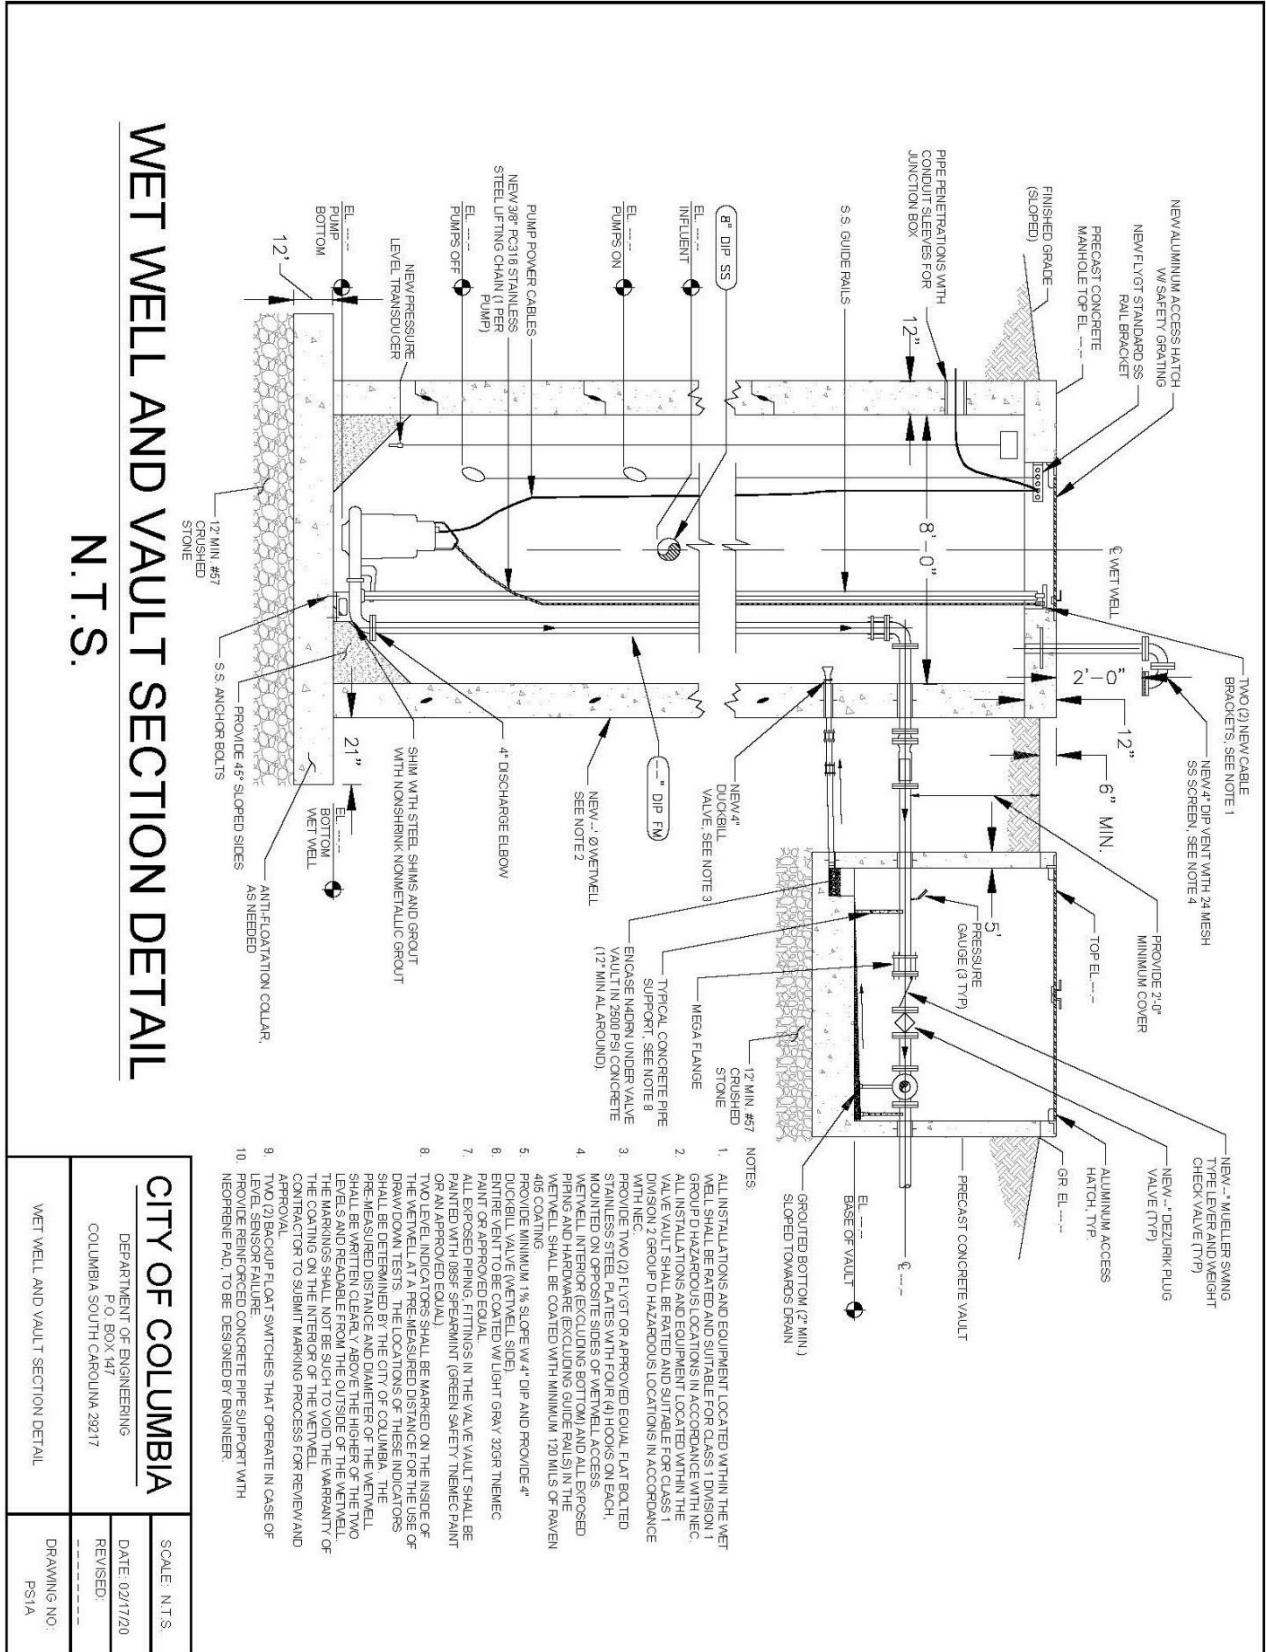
PS1A - Wet Well and Vault Section Detail
